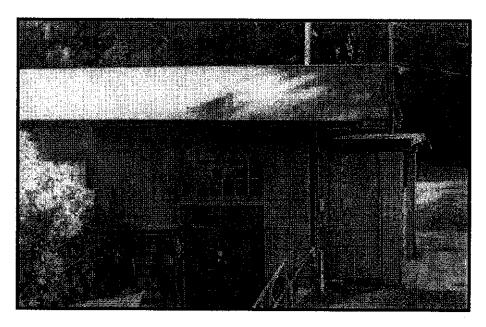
Zayante Depot, Two Level Construction; Doors to Lower Baggage Level, West Elevation, Facing East.
